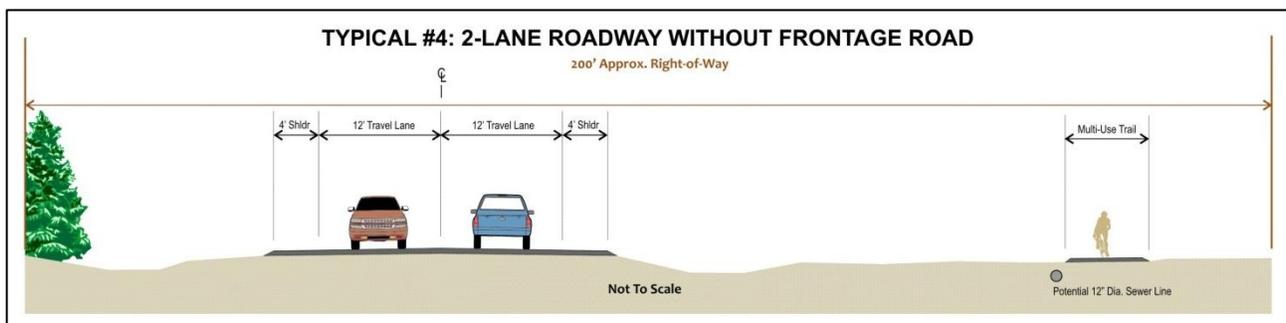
Typical Section #4 – 2-Lane Roadway without Frontage Road
